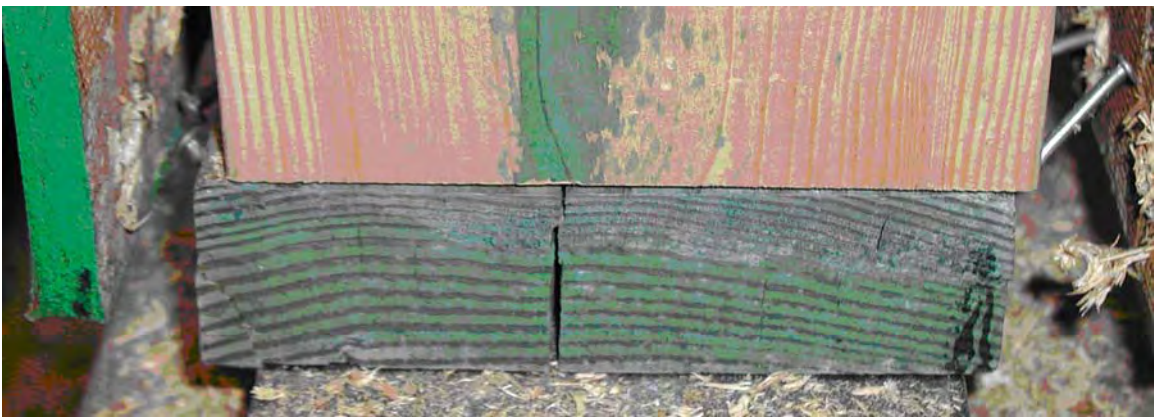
Splitting of bottom plate at south end of wall (Wall G2)
